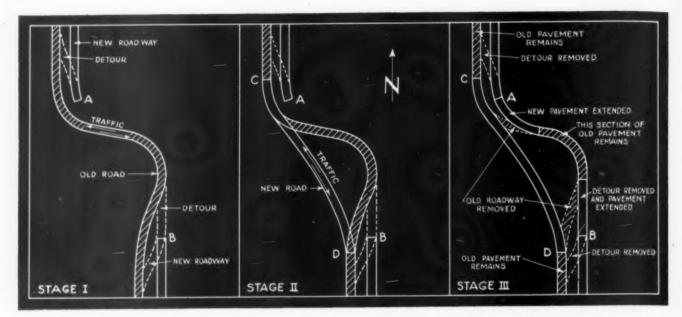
Showing the three stages by which a crooked hill road was straightened and second pavement built without serious interference to traffic
